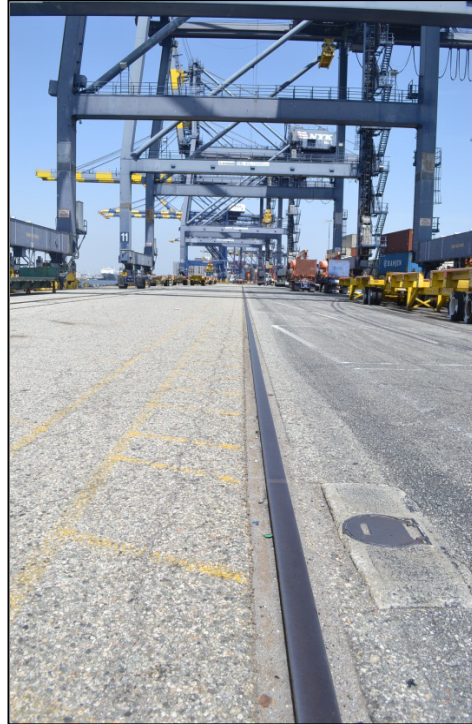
Gantry Cranes P18<sup>b</sup> and P19<sup>b</sup> (110'3" outreach and 13 containers wide) at Berths 217-220
